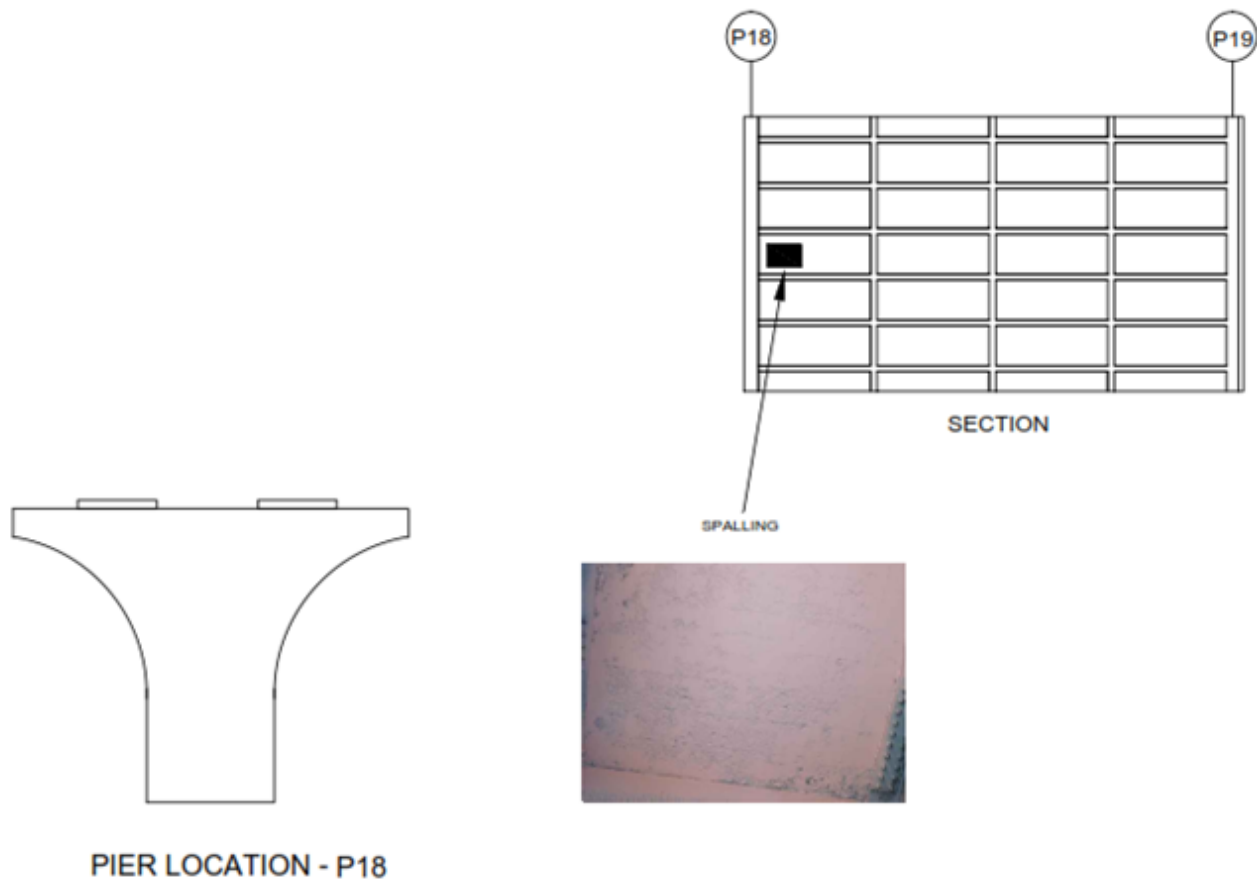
Spalling noticed in one panel in between P18-P19
